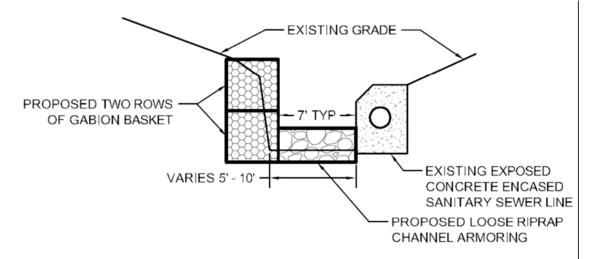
Concept Cross Section of Proposed Bank and Channel Armoring between Stations 35+70 and 34+80.
